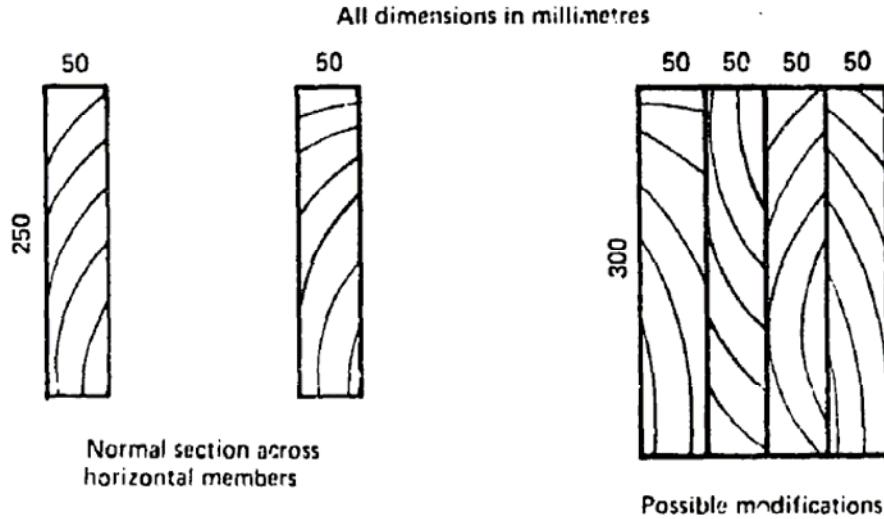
Recommended Kenyan truss top chord modification (Parry 1981)
